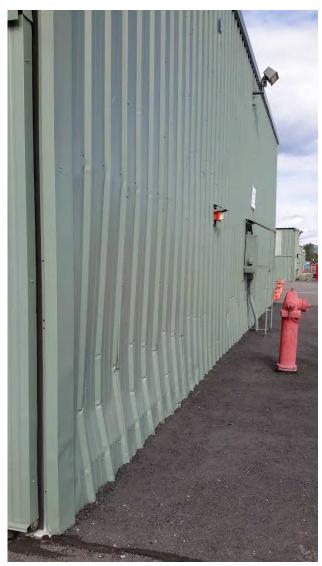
Hangar F - wall panel damage on north end from snow and ice
